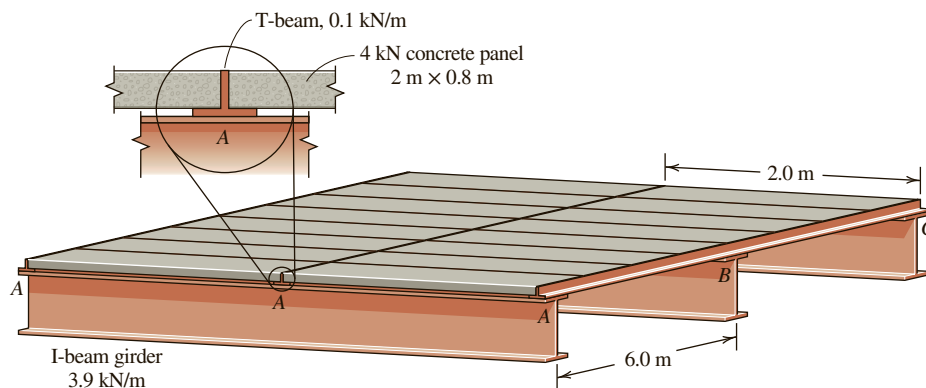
Schematic of roof support with girder: T-beams and panels (to locate, see Figure SA10.4.1).
